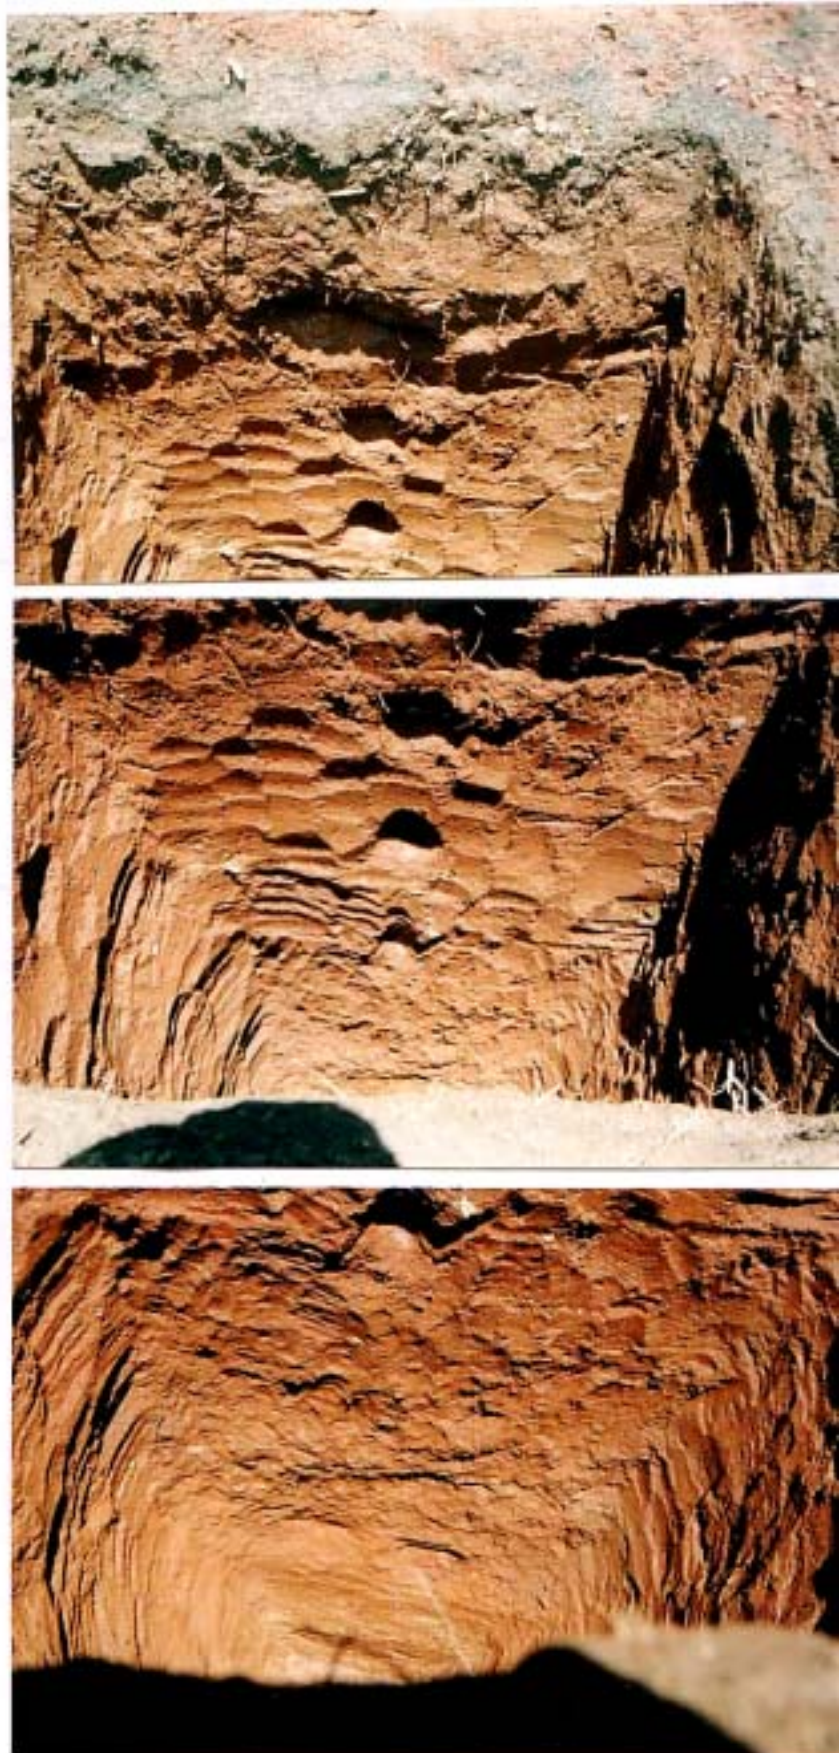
Photograph of Left Bank Test Pit No.4 (2/2)
